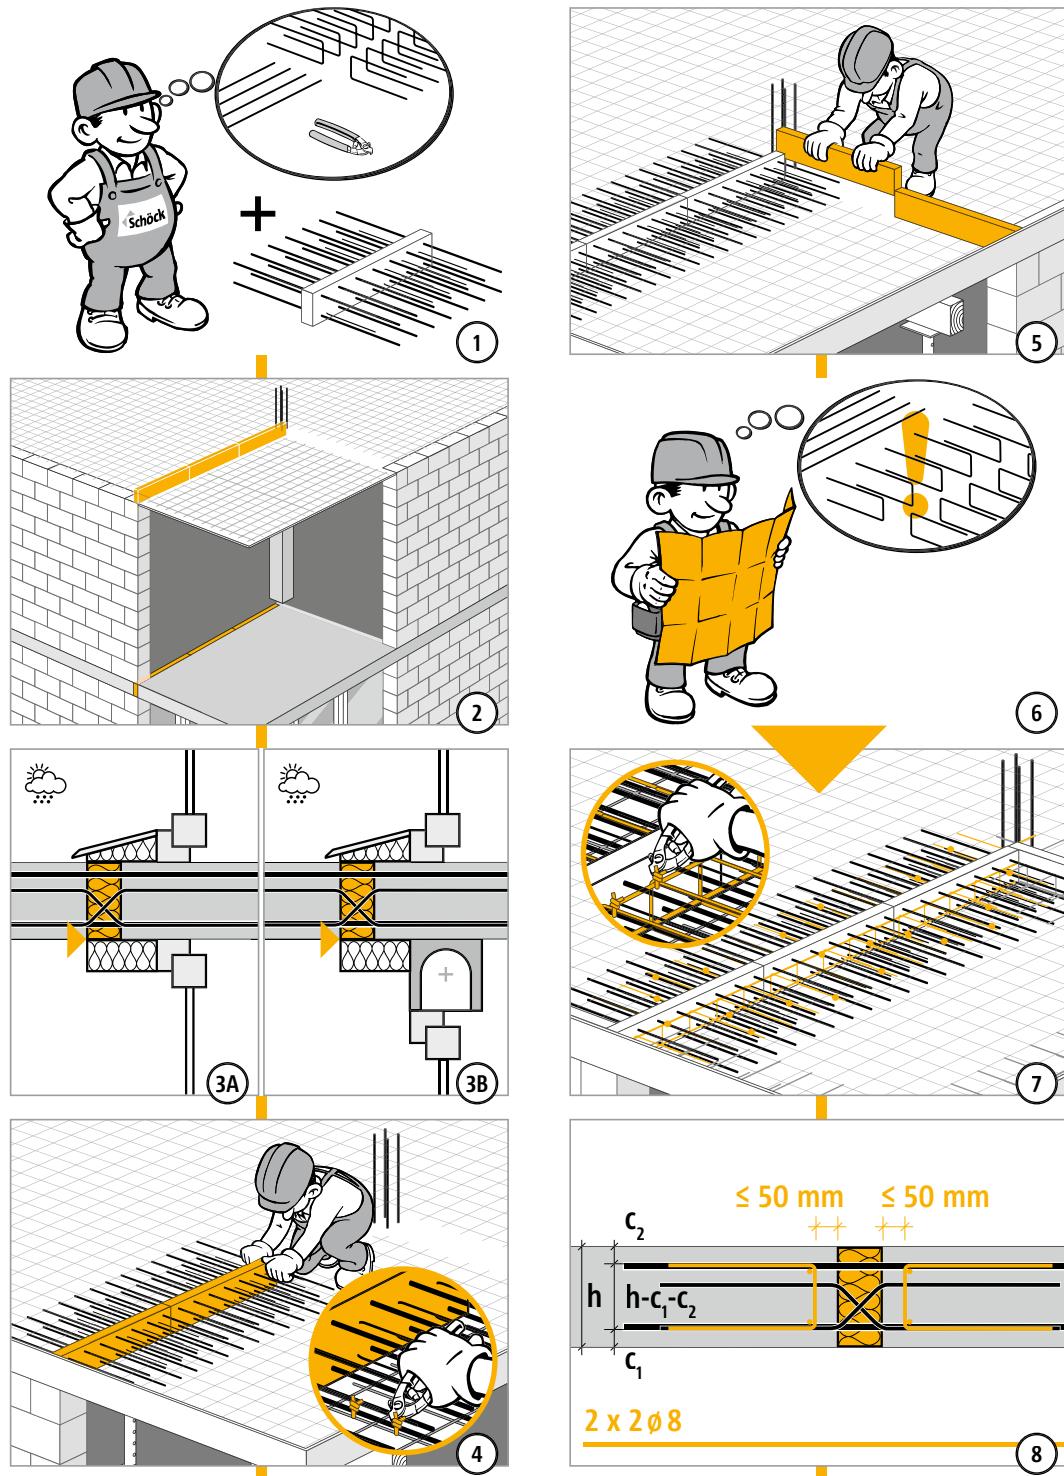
Schöck Isokorb® type D.. additional reinforcement
